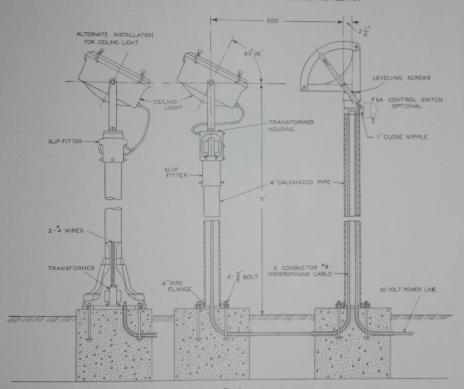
Installation Details of Type DCE-16 Ceiling Projectors and Ceiling Height Indicator
